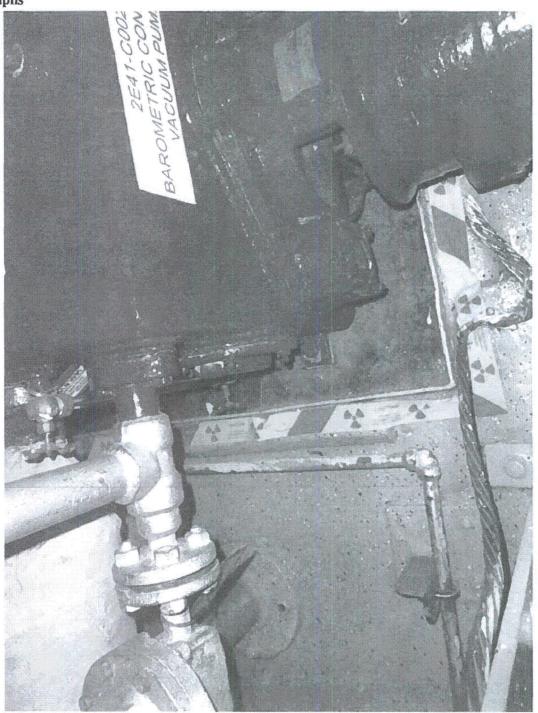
Surface Oxidation on 2E41-C002-2 Anchors (Unit 2 HPCI Room)
